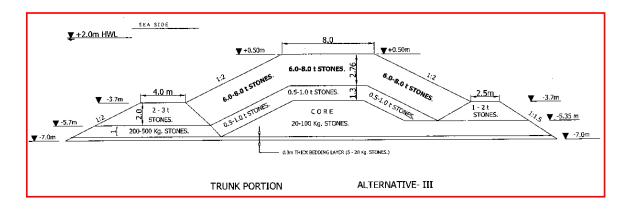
Cross-section of offshore reef with stones in the armour and crest- Alt-III
